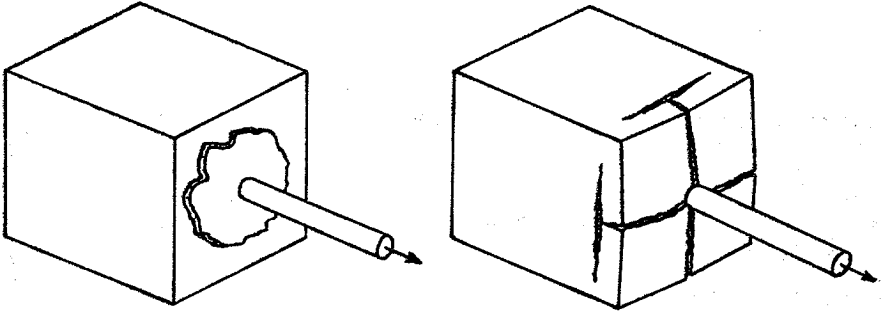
Anchorage test with reinforcing bars having only a single transverse rib from Lutz [66.1].
